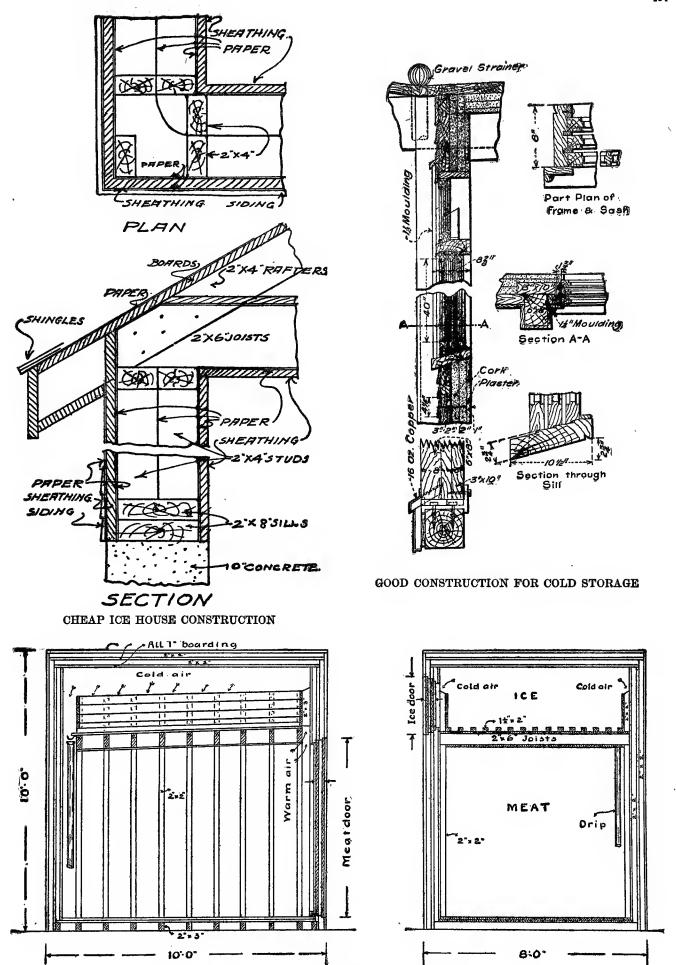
CONSTRUCTION FOR COLD STORAGE
